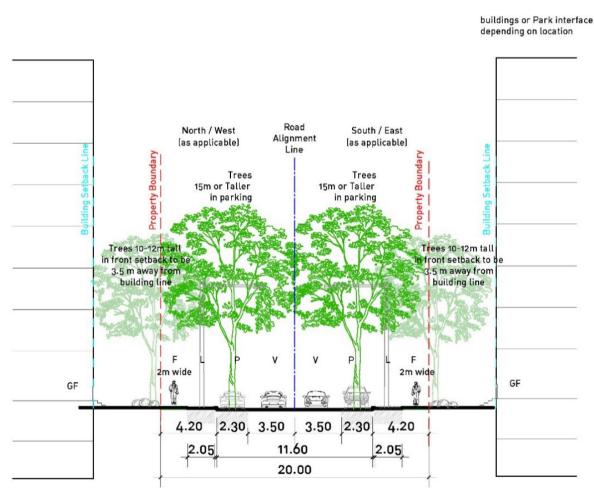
Type 3 Main East West Connector road
